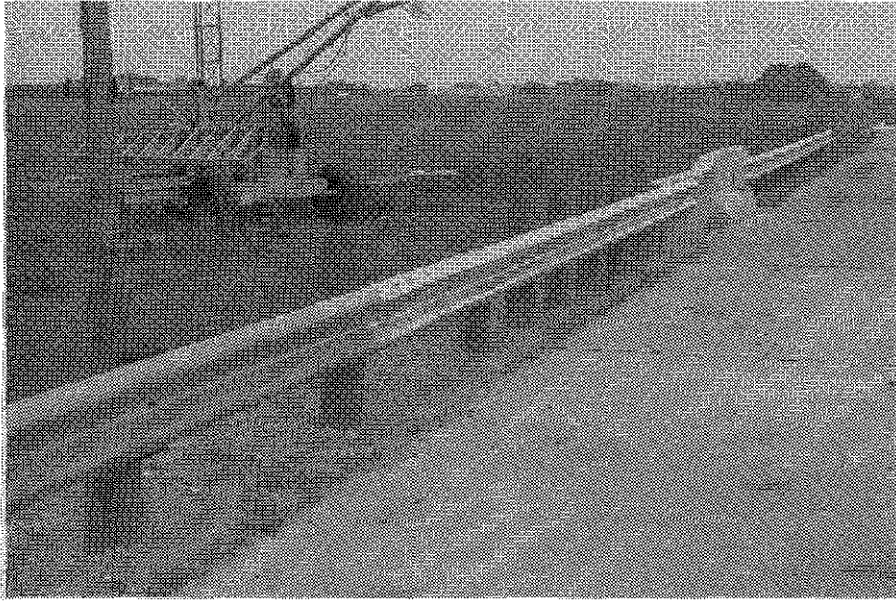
TUBULAR W-BEAM TRANSITION TO VERTICAL WALL,
